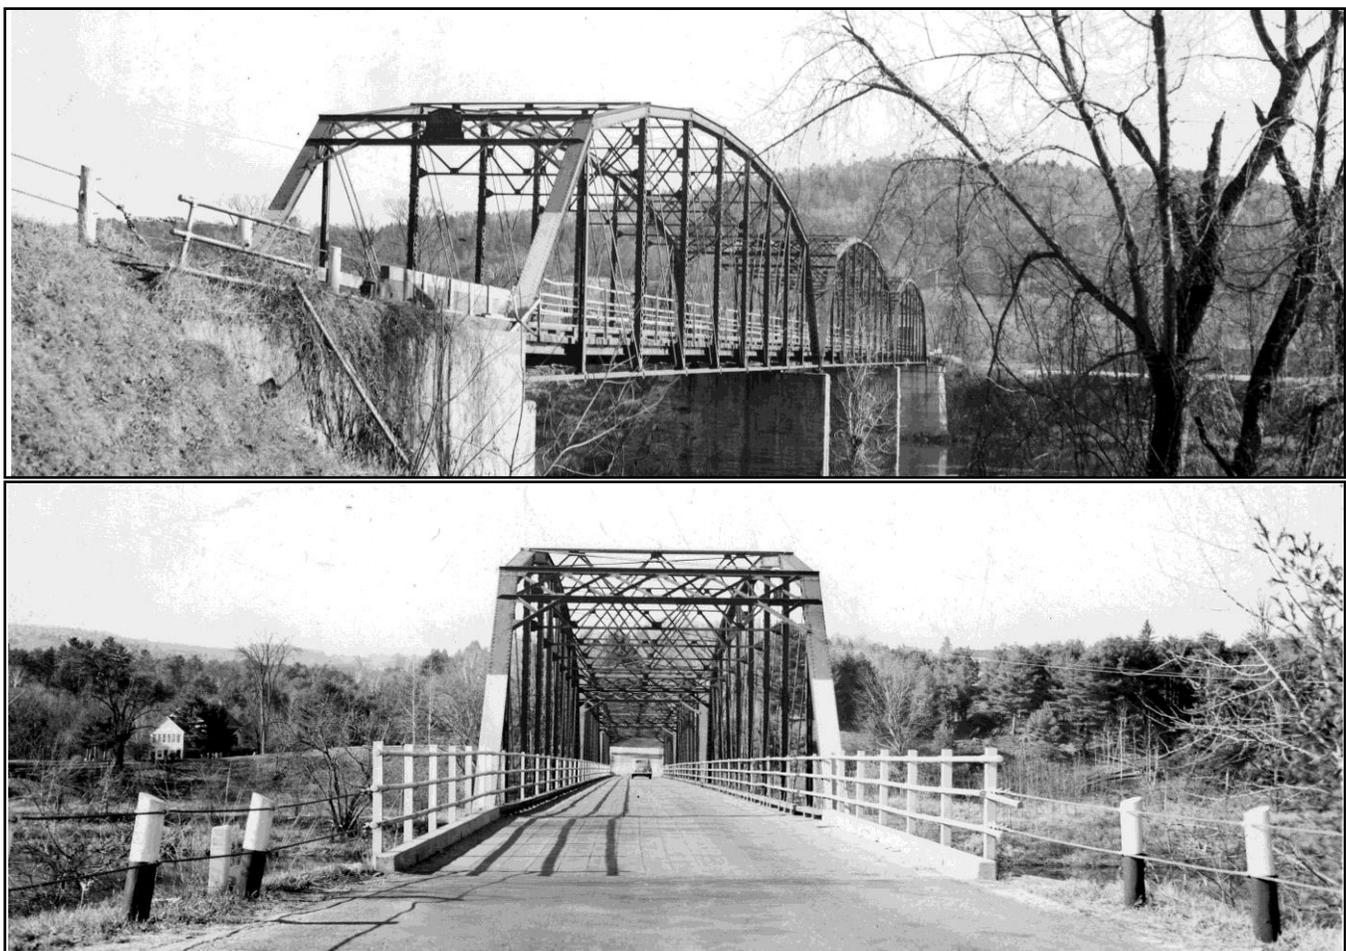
Claremont 065/137, "Ascutney Bridge" (1908). This bridge replaced the 1837 Claremont Toll Bridge, destroyed by freshet and ice in 1901. The east abutment was undermined in 1927 flood and replaced with a concrete pier and 40' I-beam approach span making it a 4-span bridge. Downstream side, top; east portal and 1928 approach span, bottom. Photos dated 11/19/1940 (NHHD Bridge Inventory Card).
